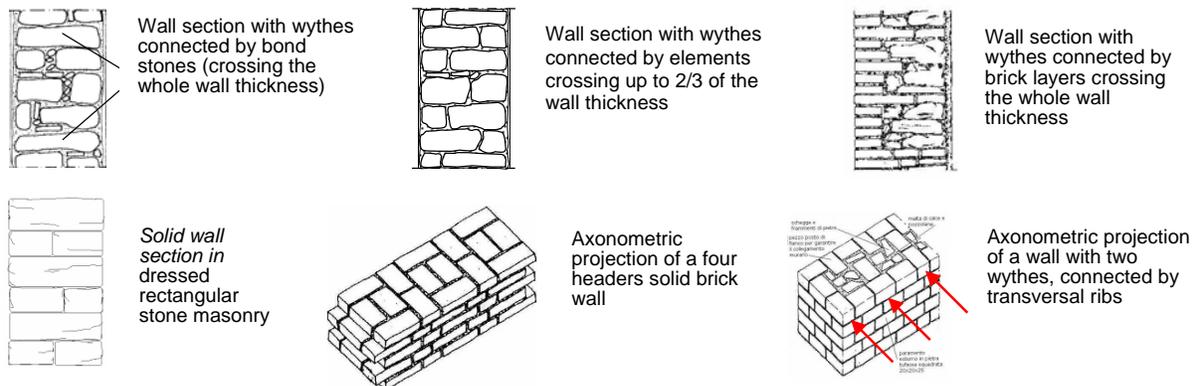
Masonry wall with well connected wythes or with a single wythe (Pc)
